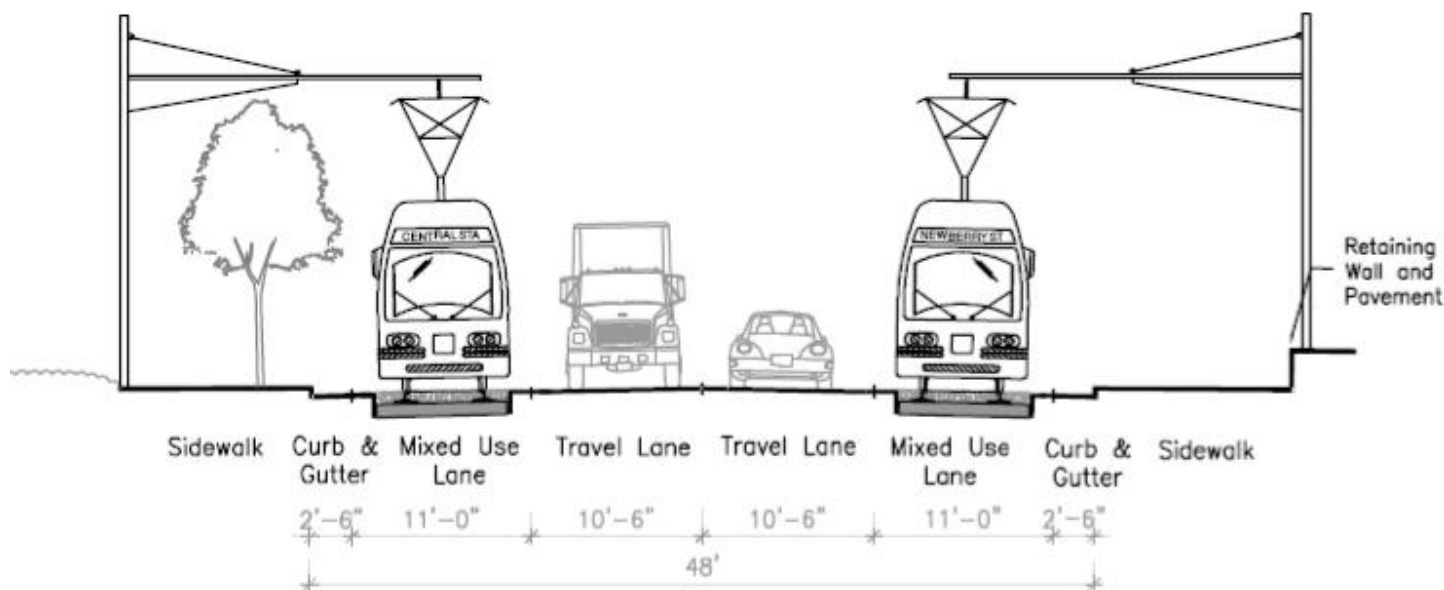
Proposed Typical Section on Market Avenue south of Fulton Street
